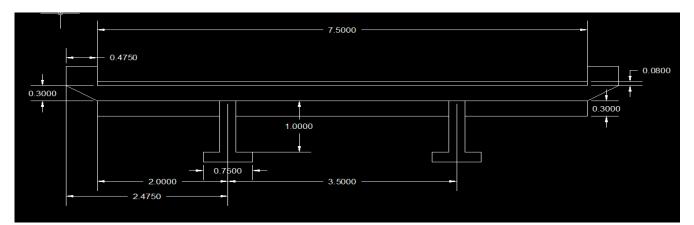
PSC I GIRDER BRIDGE TRANSVERSE SECTION
